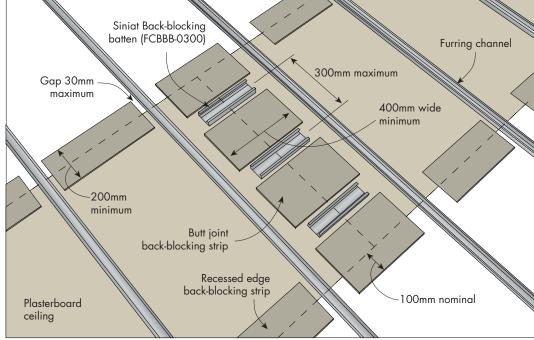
Placement of Back-Blocking Batten and Back-Blocking Strips for Recessed and Butt Joints
